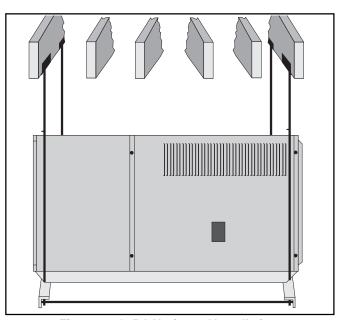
G6RA Horizontal Installation Suspended in Attic or Crawl Space
